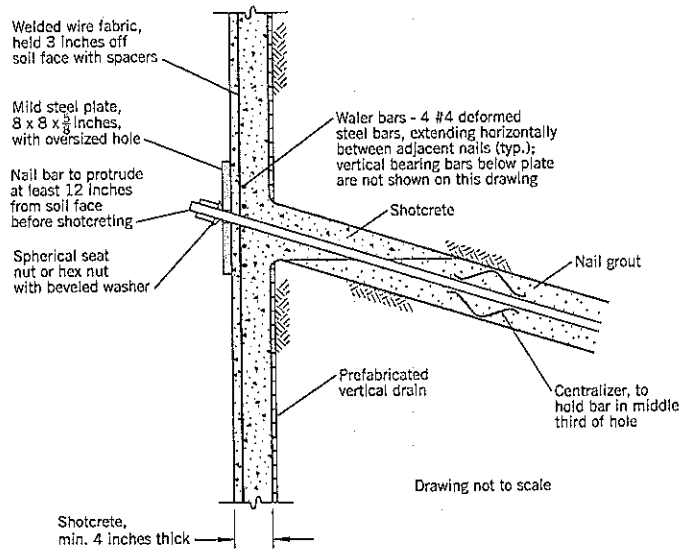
Example of soil nail/wall face connection details (after Cotton, 1992).
